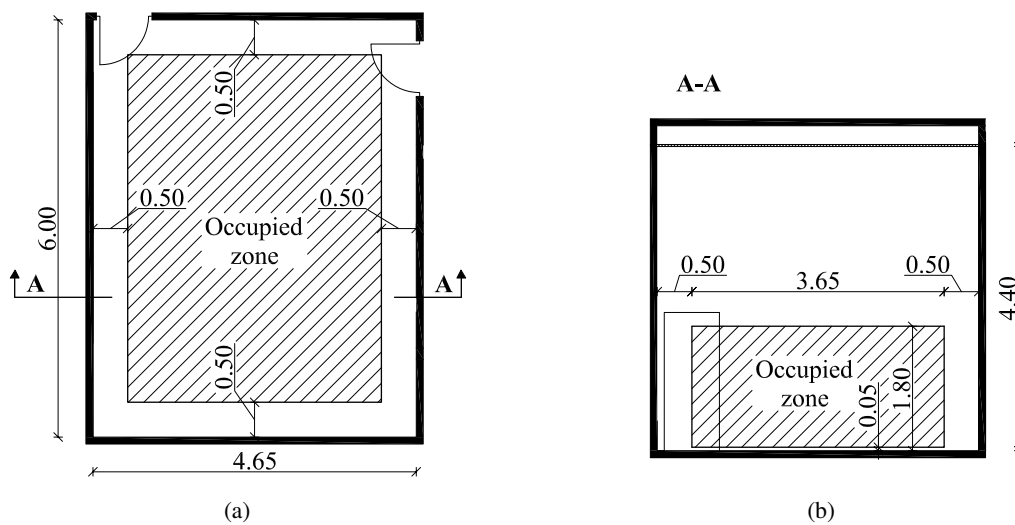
Occupied zone in the room on a) plan, b) cross-section.
